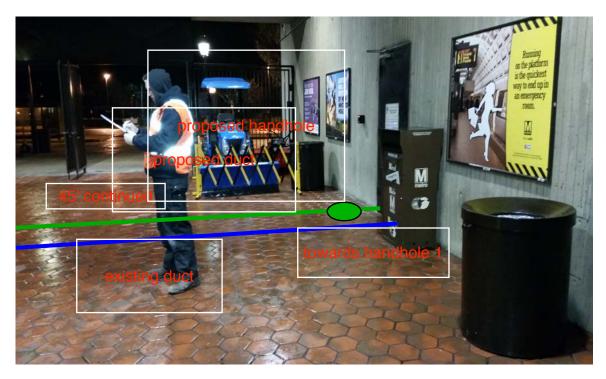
C12 Braddock Road: Existing duct run from kiosk towards existing handhole 1 and proposed conduit from proposed handhole on mezzanine floor towards AFC panel.
